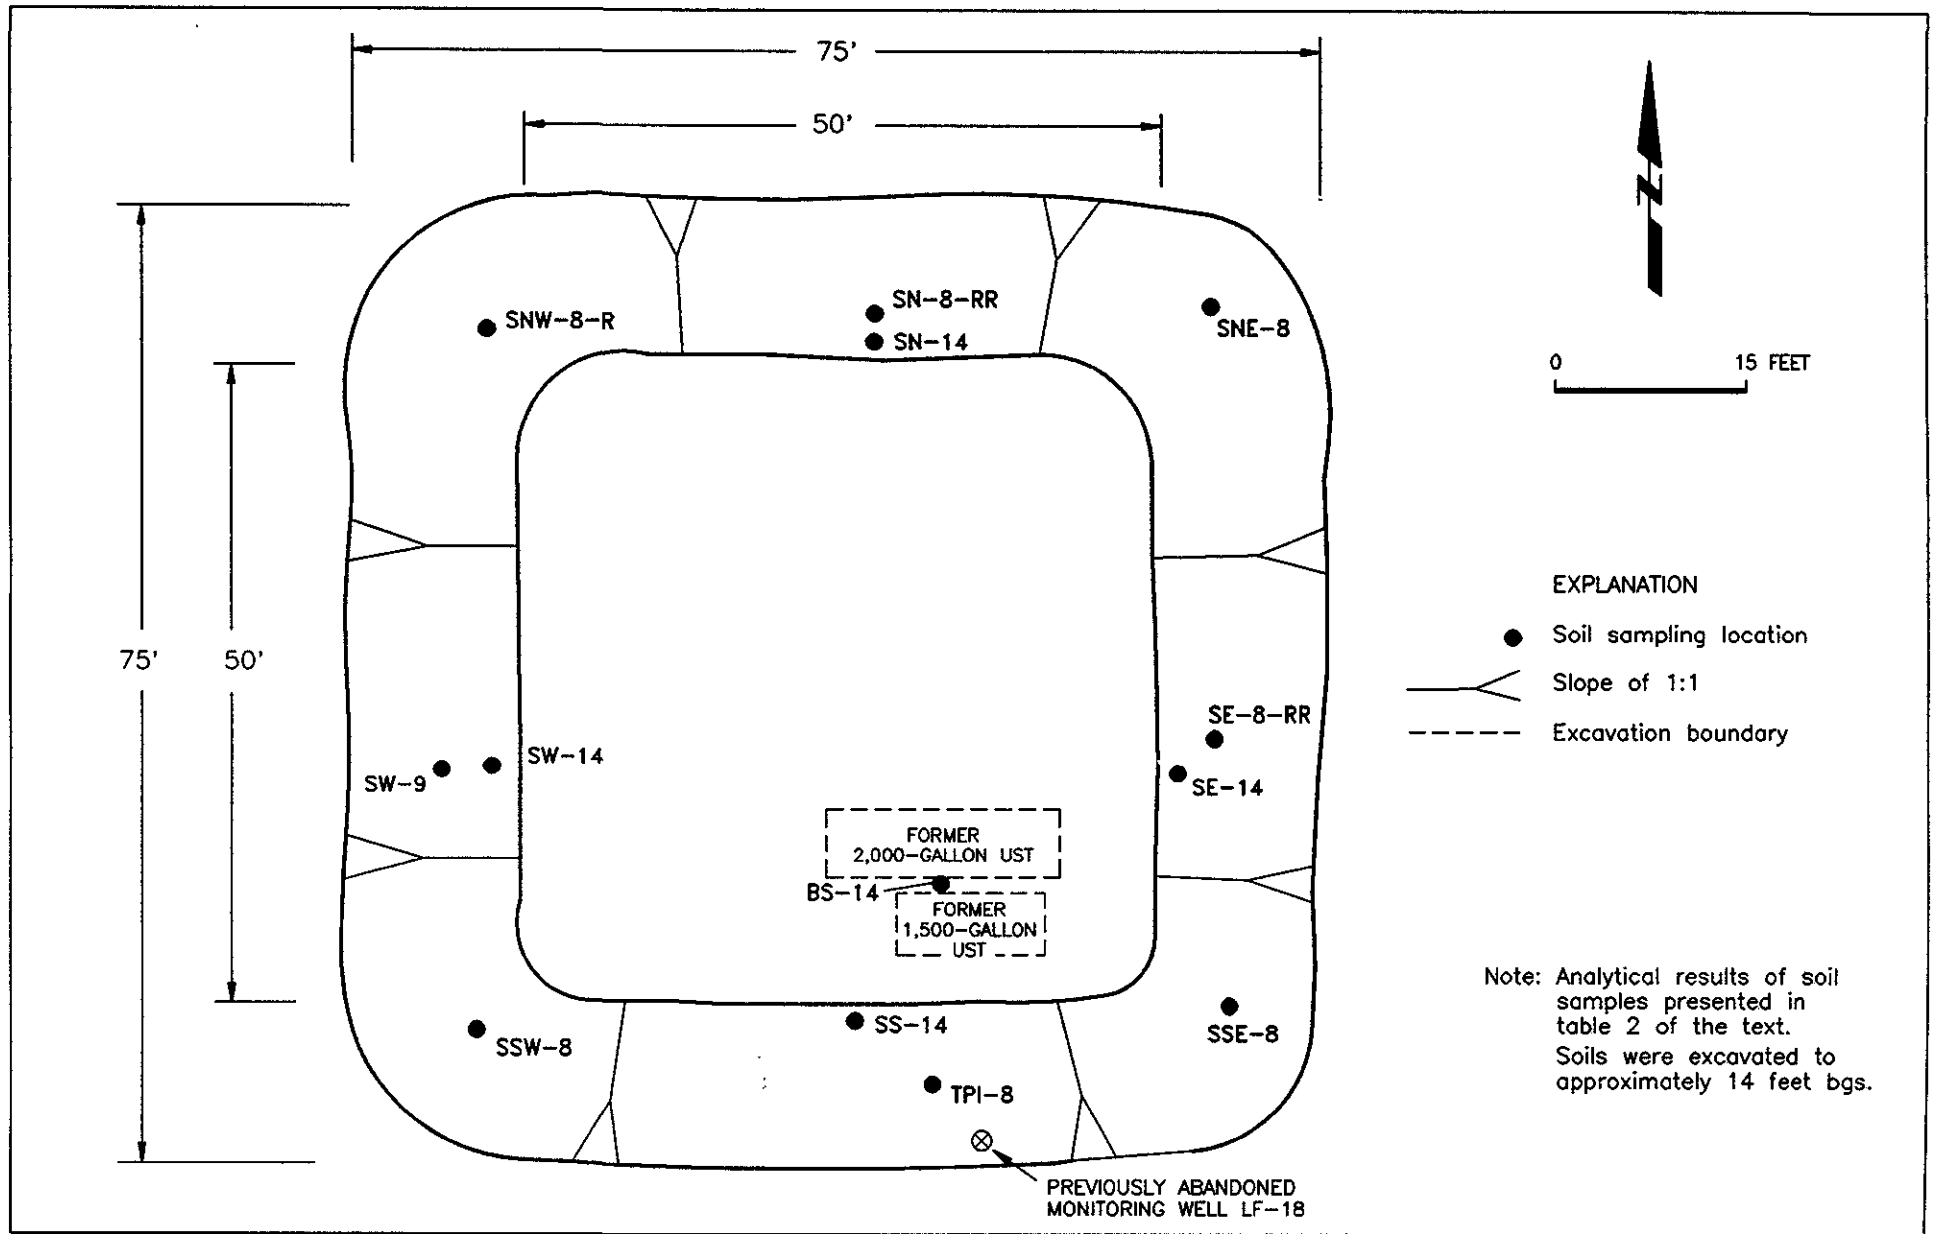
FINAL EXCAVATION BOUNDARY AND FINAL CONFIRMATION SOIL SAMPLE LOCATIONS
